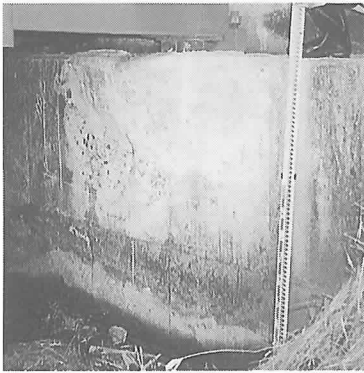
Failure of the anchor support, cracking, and scaling of the concrete abutment (road bridge, composite girder, Manmen in Bekkai town)
